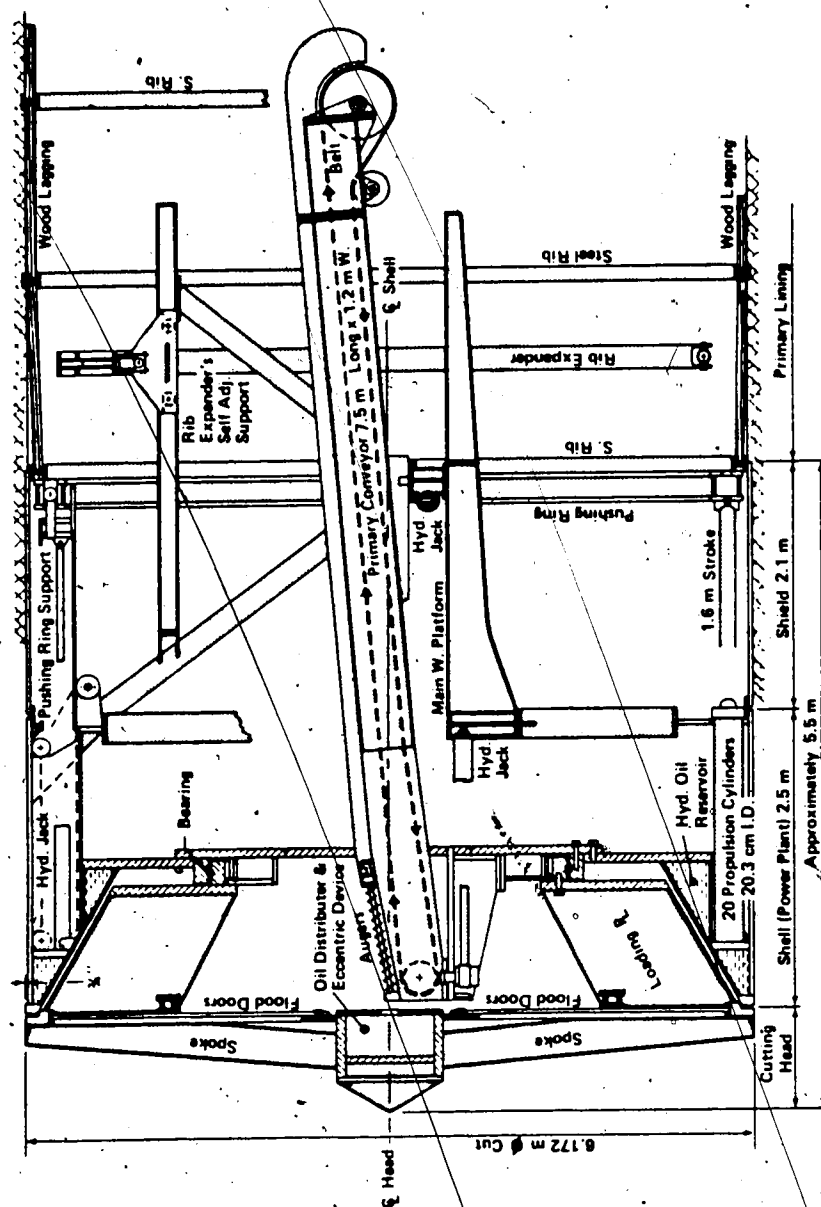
SECTION THROUGH THE SHIELDED MOLE (AFTER LOVAT TUNNELING EQUIPMENT INC.)
